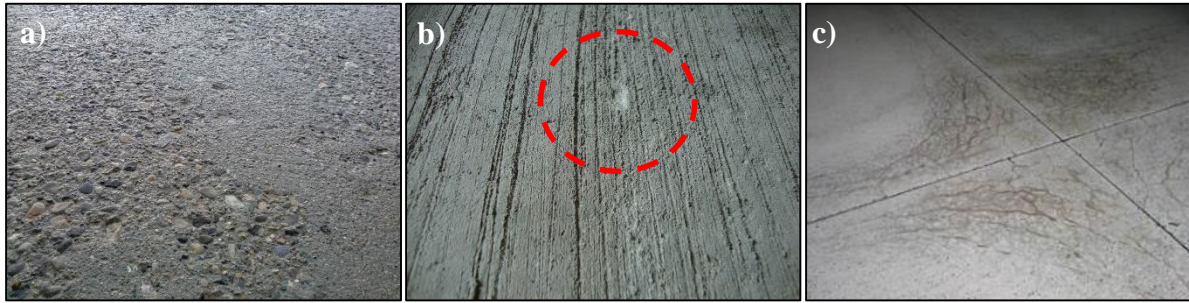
a) Scaling b) popouts and c) D-Cracking distresses in PCC pavements
